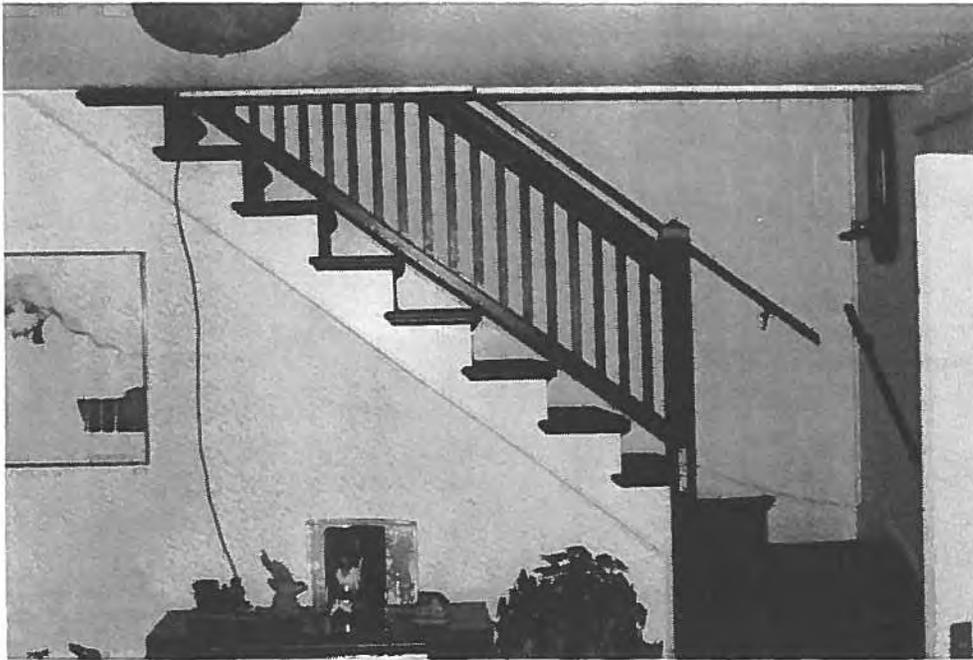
Interior of residence, stairs leading from living room to second floor.
